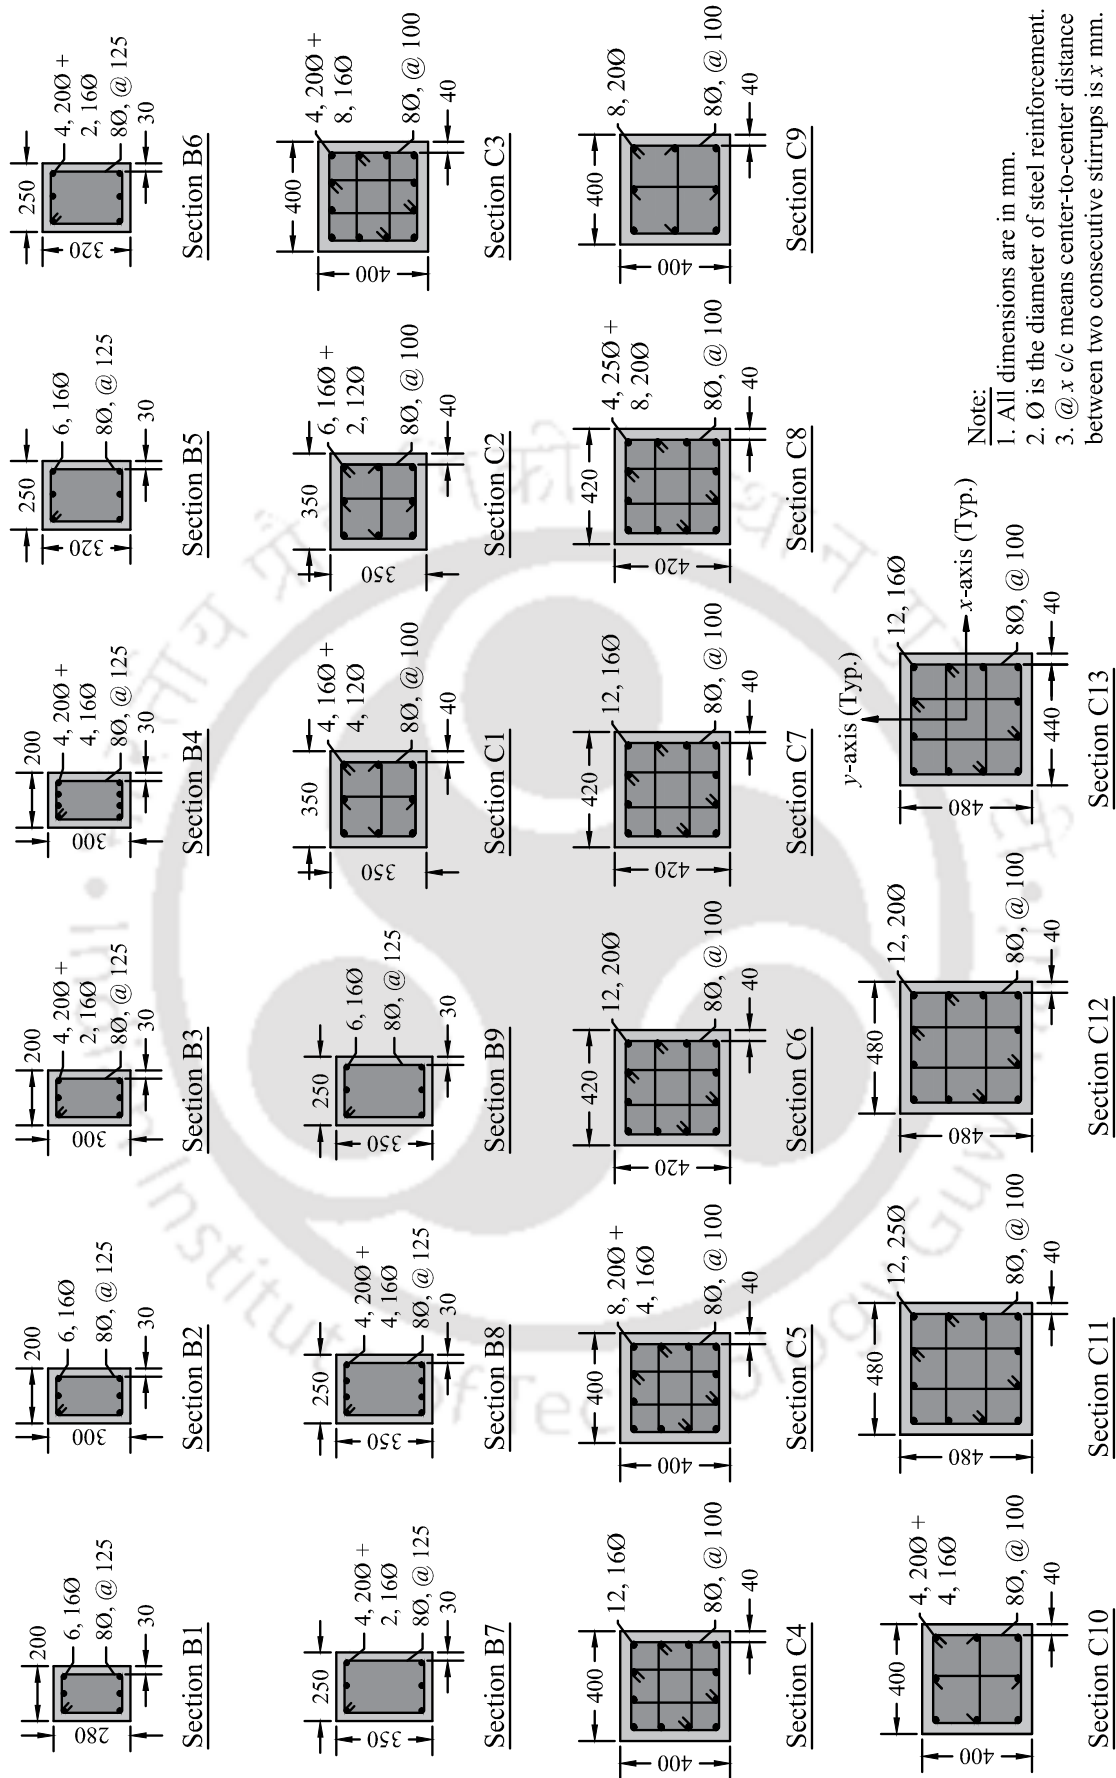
Cross-sectional details of different beam and column sections used in the sample RC buildings (refer to Table 4.1)
